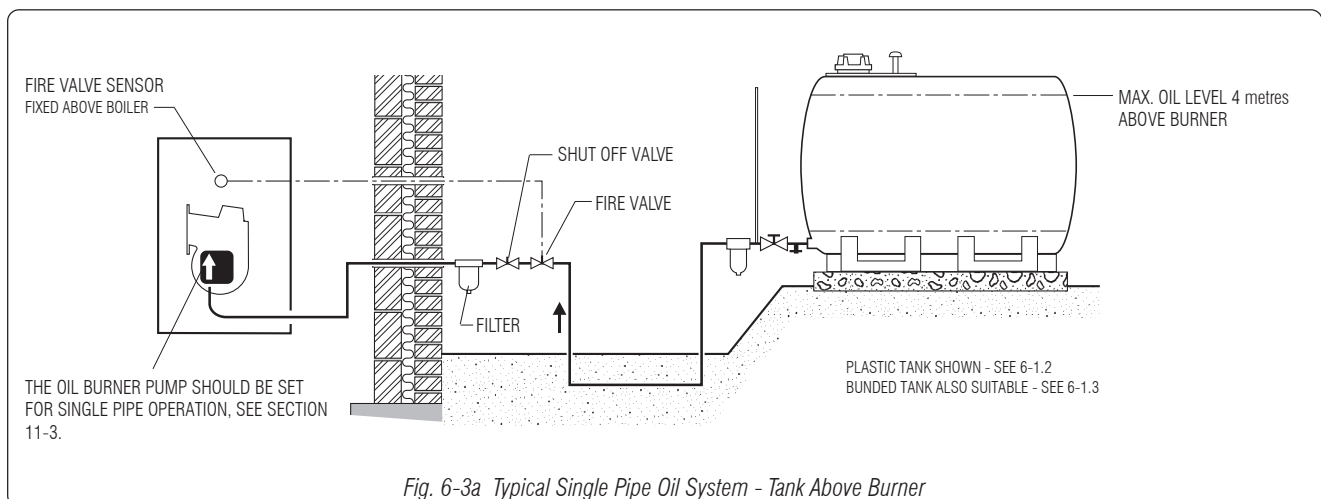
Typical Single Pipe Oil System - Tank Above Burner
